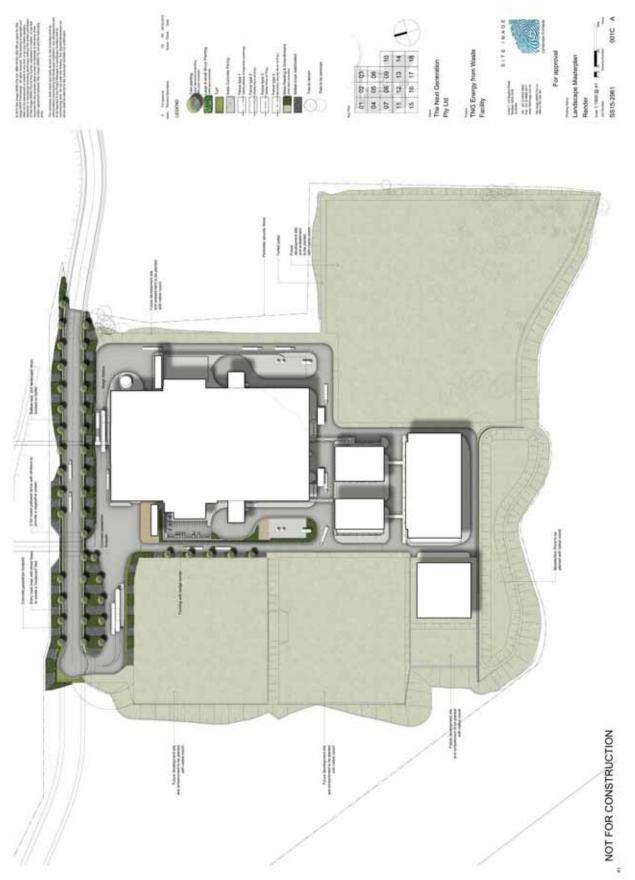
SITE LANDSCAPE MASTER PLAN (SOURCE: SITE IMAGE)
